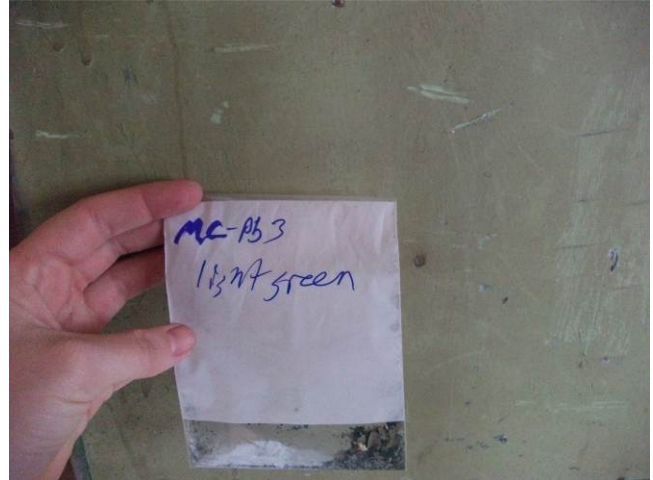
Metal Clad Storage Building at CCGB Prescott
